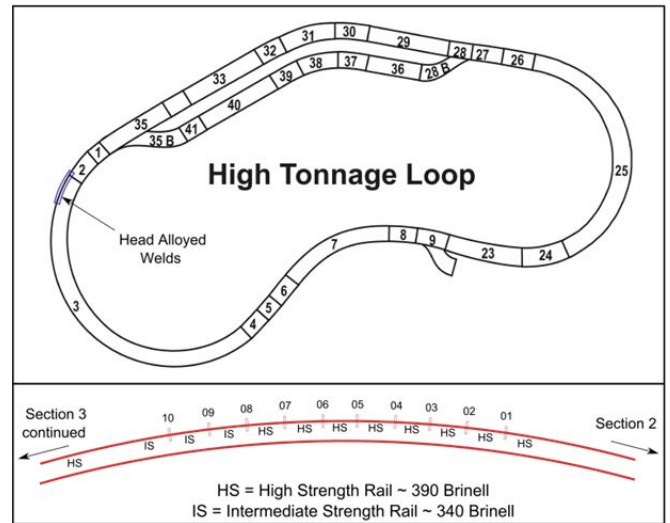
(top) Map of HTL Showing Location of Test Welds (bottom) Layout of Welds in Test Zone (~20-foot distance between welds)
